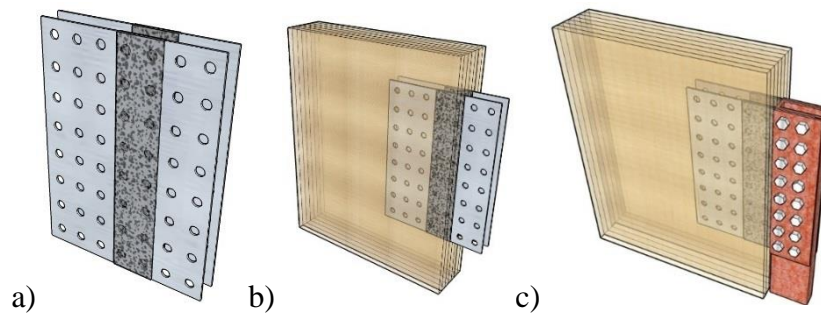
Modified HSK hold-down: a) Use of Duct Tape; b) Inserted into CLT panel; c) Complete system
